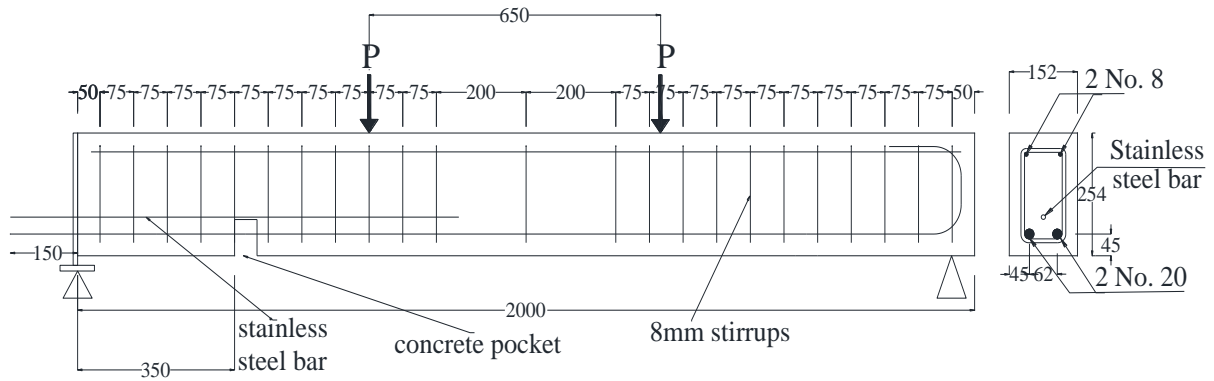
Beams with stirrup configuration B; 75 mm spacing between stirrups in the shear zone. All dimensions are in mm.
